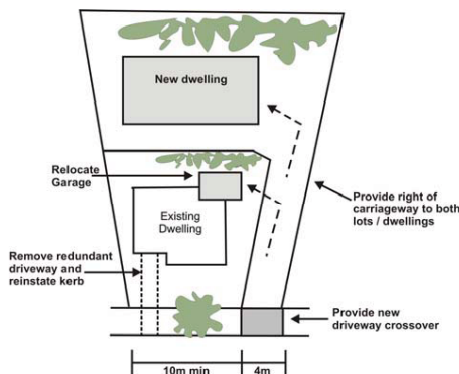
Access requirements for dual occupancy dwellings without direct street frontage
